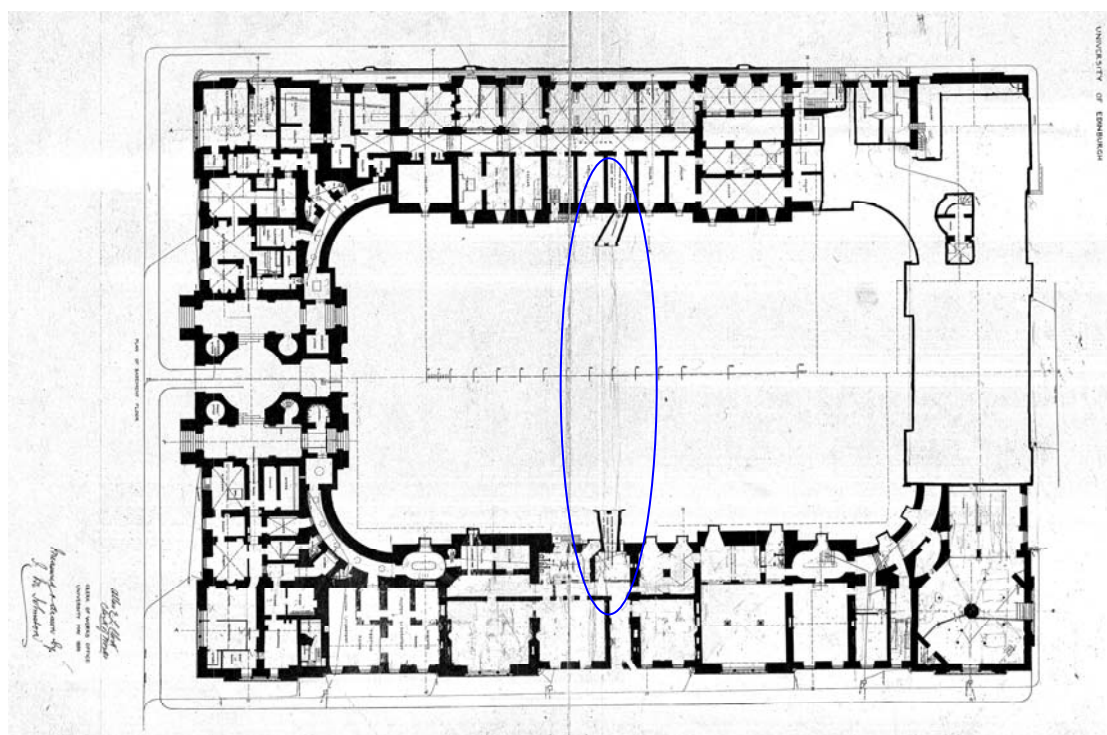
Basement plan of 1895 showing the sketched on vitiated air pipe.
